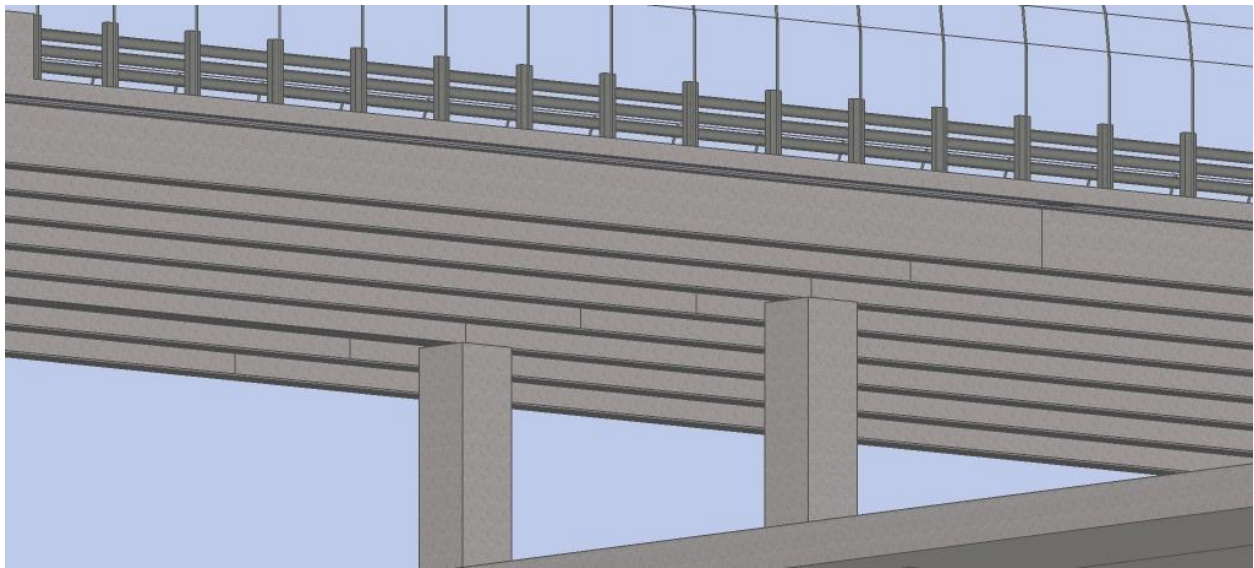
Proposed concrete columns and steel girders for Belmont Street/Route 9 Bridge re-design (View 2)
